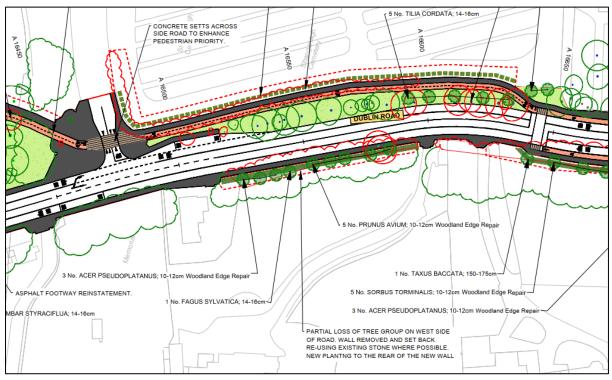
Extract from Landscape Drawings at Askefield House on Dublin Road (Sheet 47)
